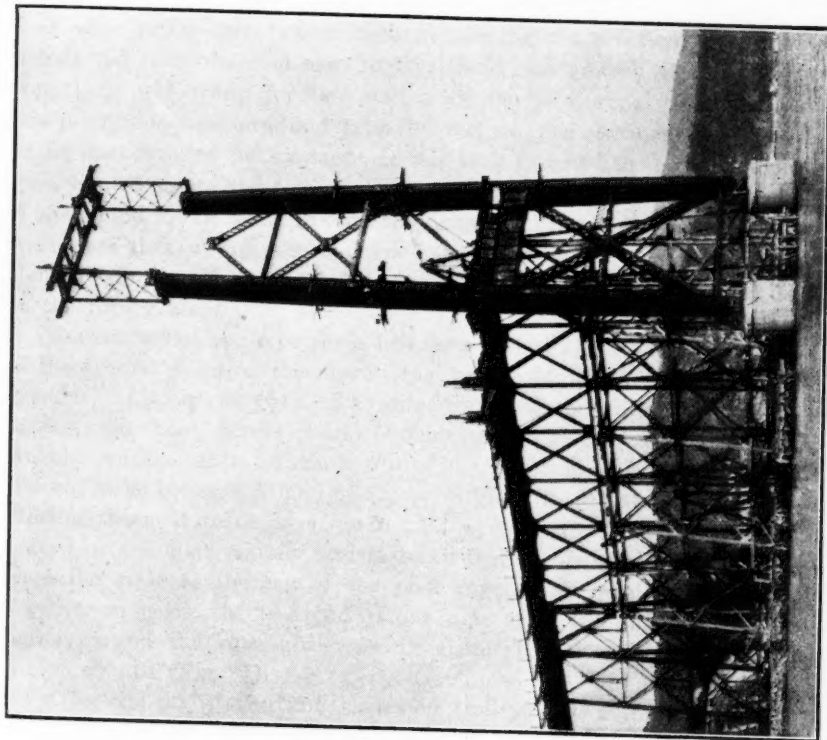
CREEPER TRAVELER ON ISLAND FOR TOWER ERECTION,
